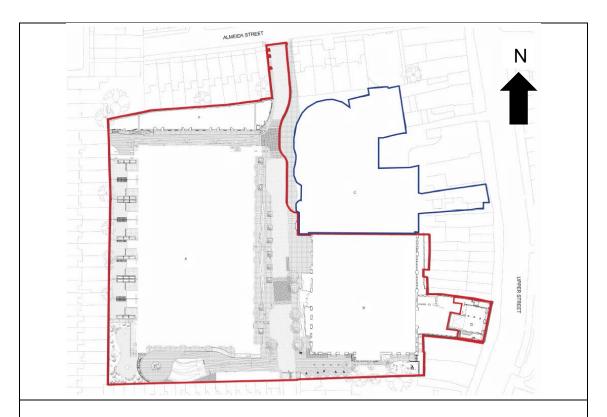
Site location with the site outlined in red. The blue line indicates other adjoining land owned by the applicant.
